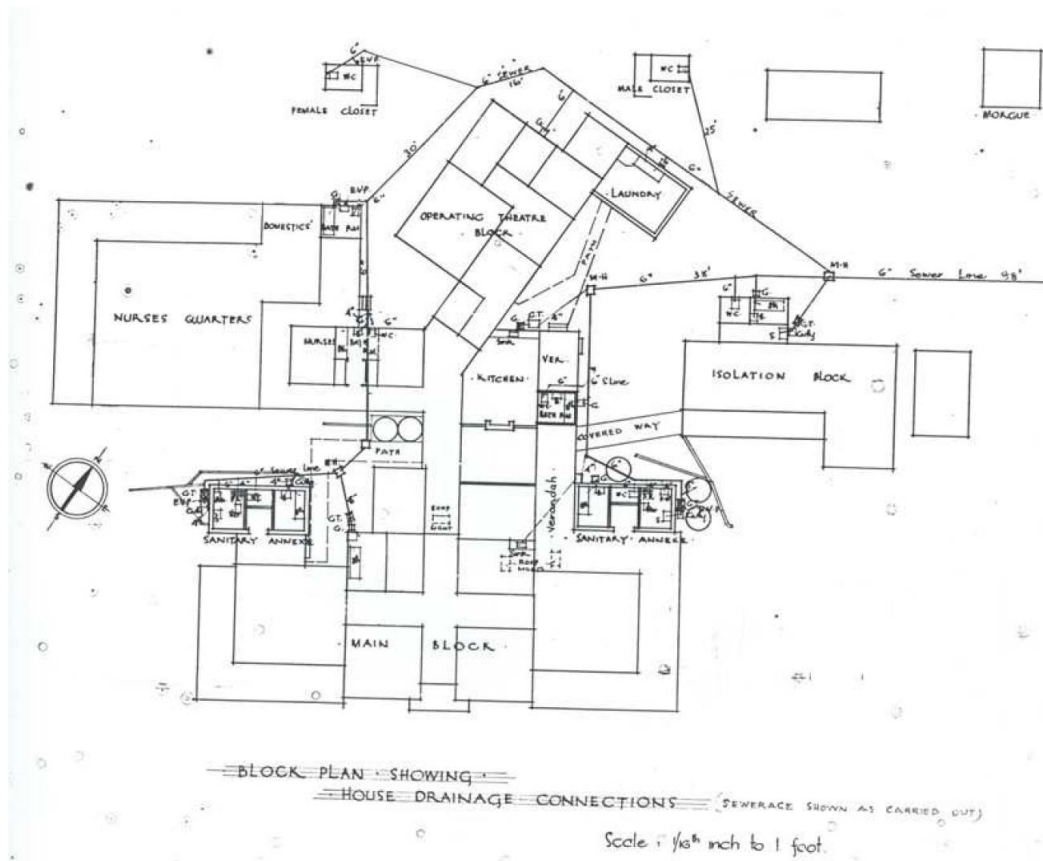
Site Plan showing Alterations and Additions (1934).
